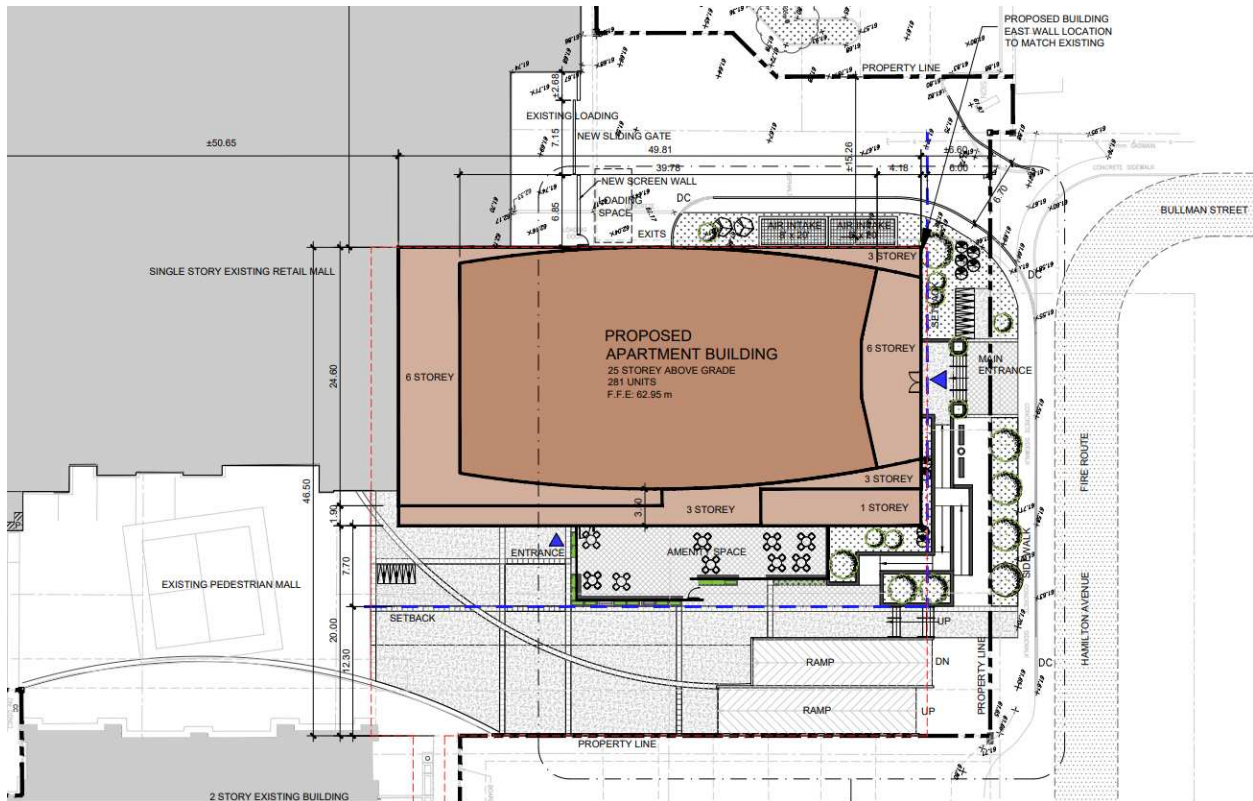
Site Plan Excerpt (N45 Architecture Inc.)
